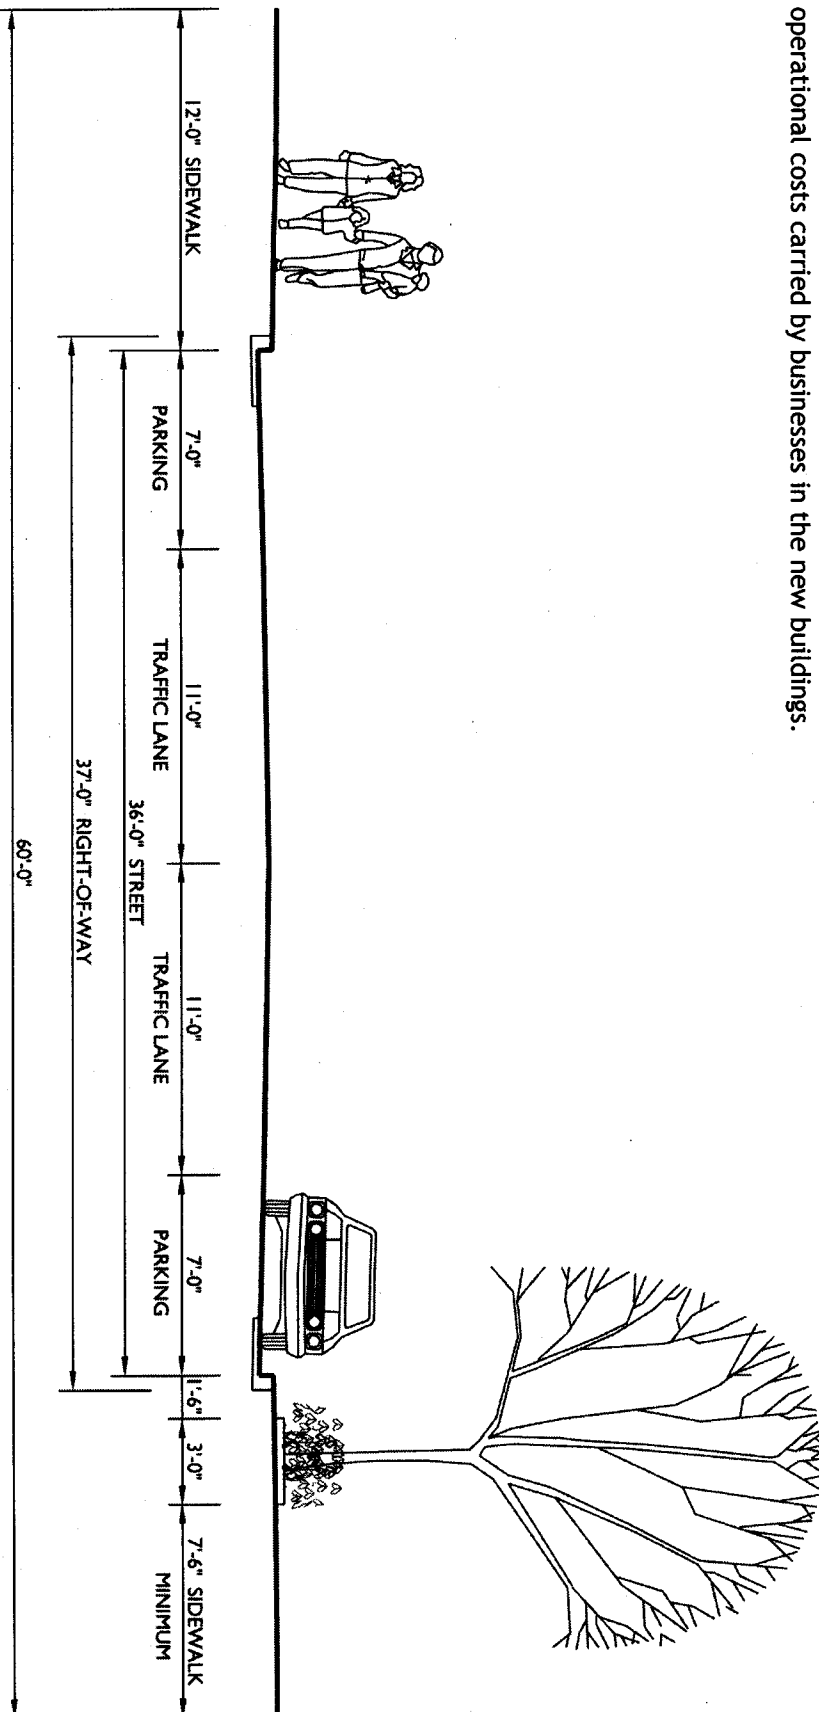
CROSS-SECTION PROPOSED EAST WEST STREET
